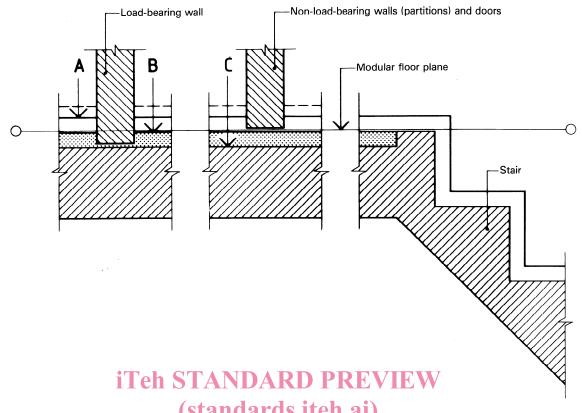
a) - Modular floor plane coinciding with upper surface of floor covering (level A)
